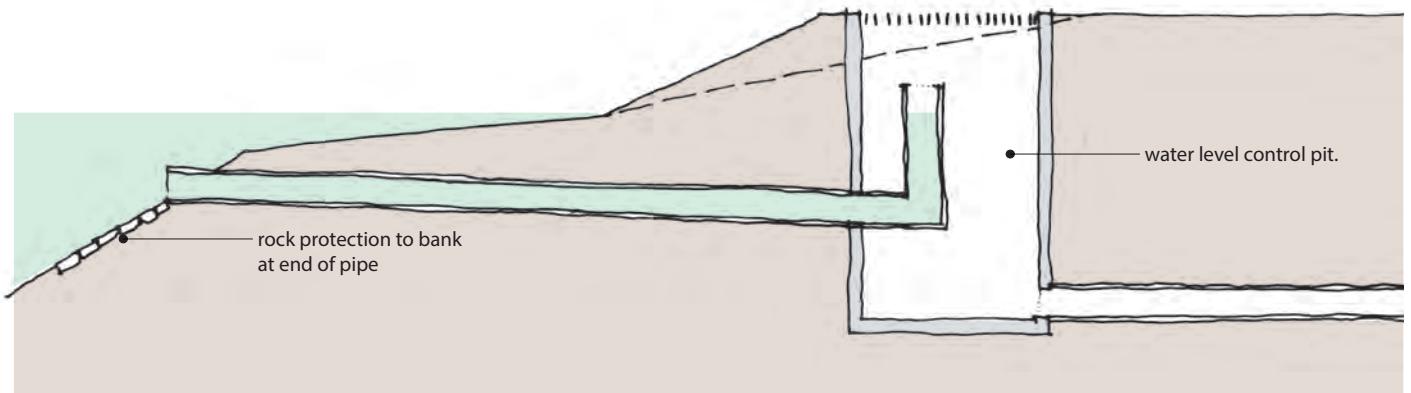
Typical Macrophyte Zone Outlet Arrangement
